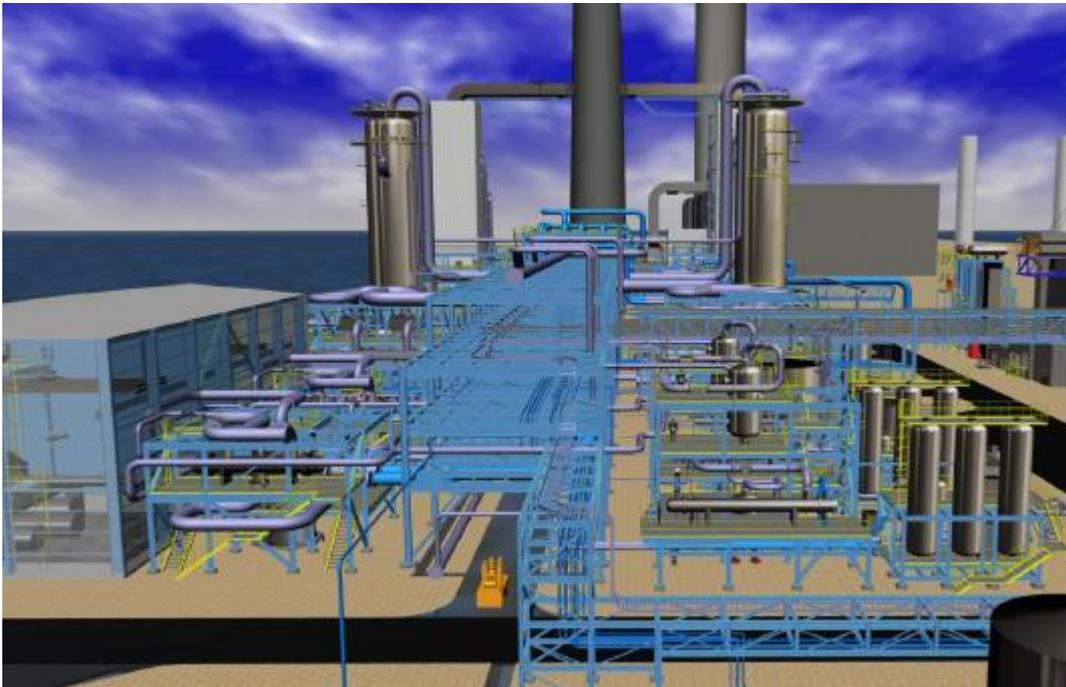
Long view of Carbon Capture Plant and CO₂ Compression and Conditioning Plant Layout [1].
